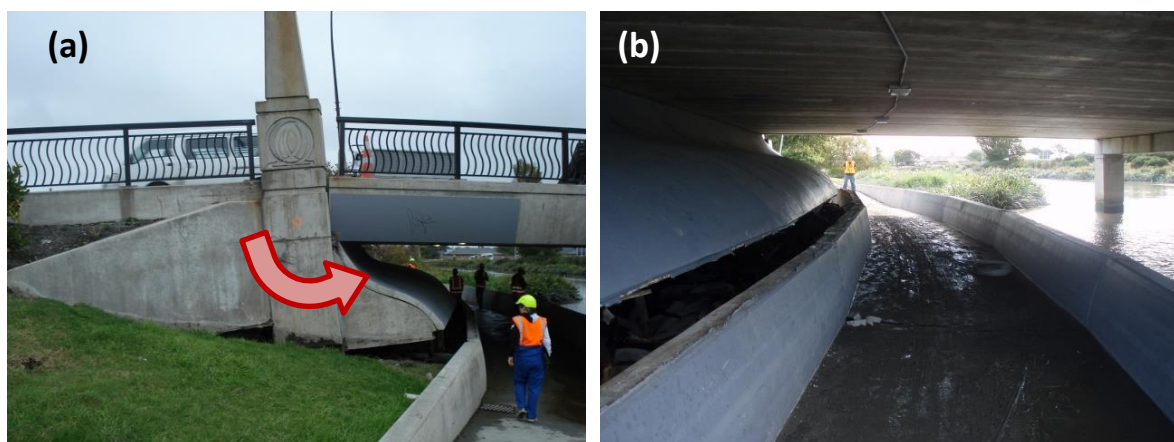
ANZAC Bridge south abutment (a) back-rotation of abutment, (b) separation of underpass from abutment
